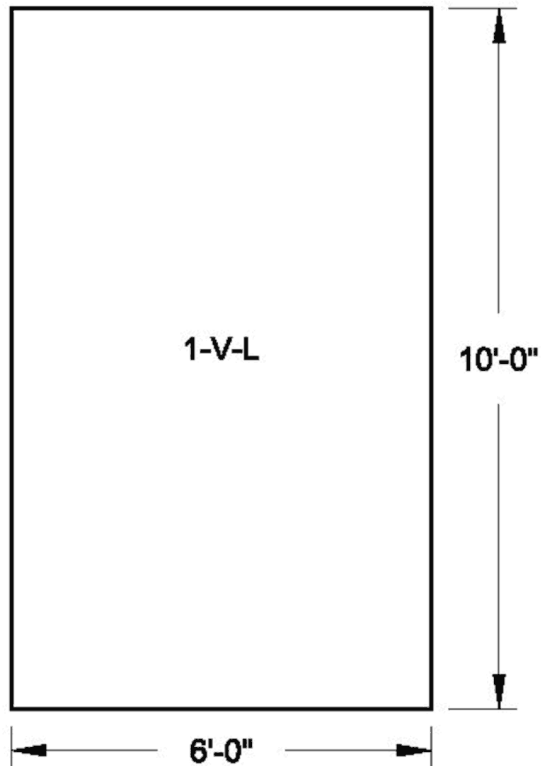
H.6-162 DGFOV Roof 6 Looking Down
